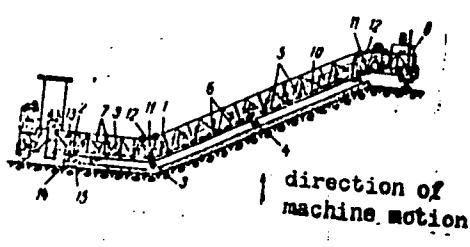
1 - frame; 2 - vibro-knife for cutting transverse joints; 3 - vibro-knife for cutting longitudinal joints; 4 - distributive nozzles; 5 - distributive nozzle valves; 6 - system of levers; 7 - discharge tank; 8 - horizontal truss of frame; 9 - inclined truss of frame; 10 - horizontal hinges; 11 - screw devices; 12 - working parts of vibro-knife for cutting transverse joints; 13 - vibro-knife support; 14 - cutting plates; 15 - vibration isolating plate.
